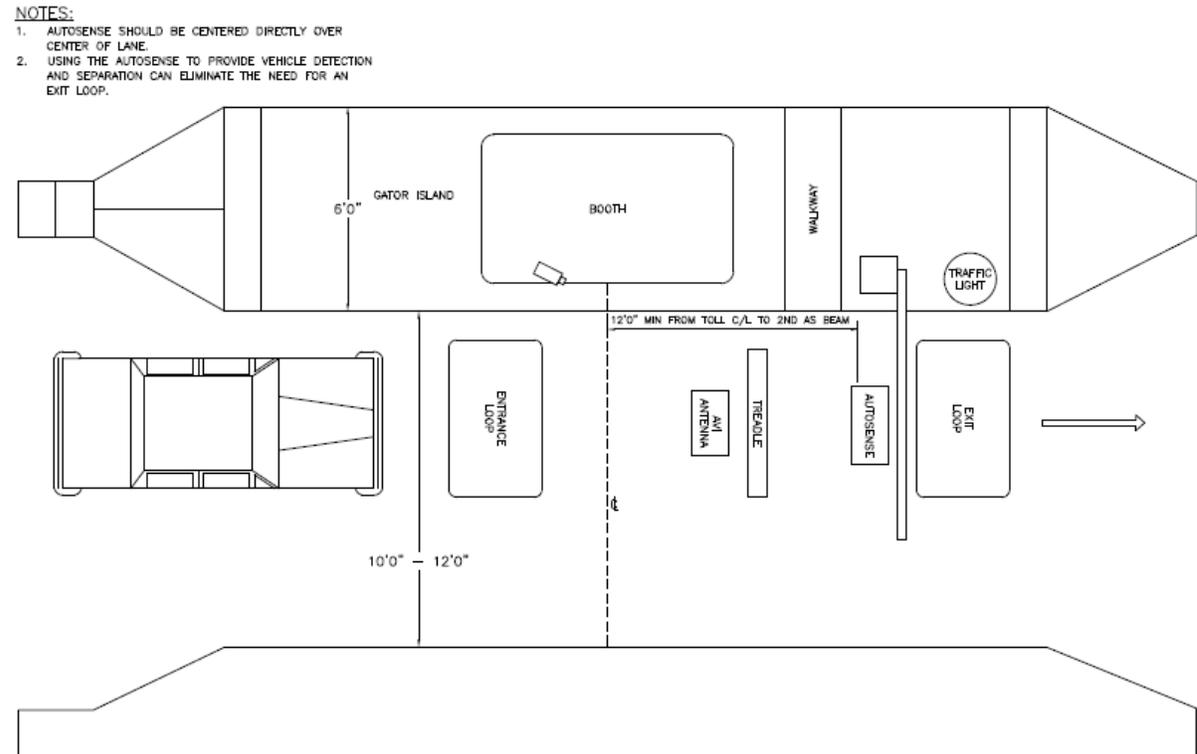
Plan of Typical AutoSense Toll Plaza Installation
